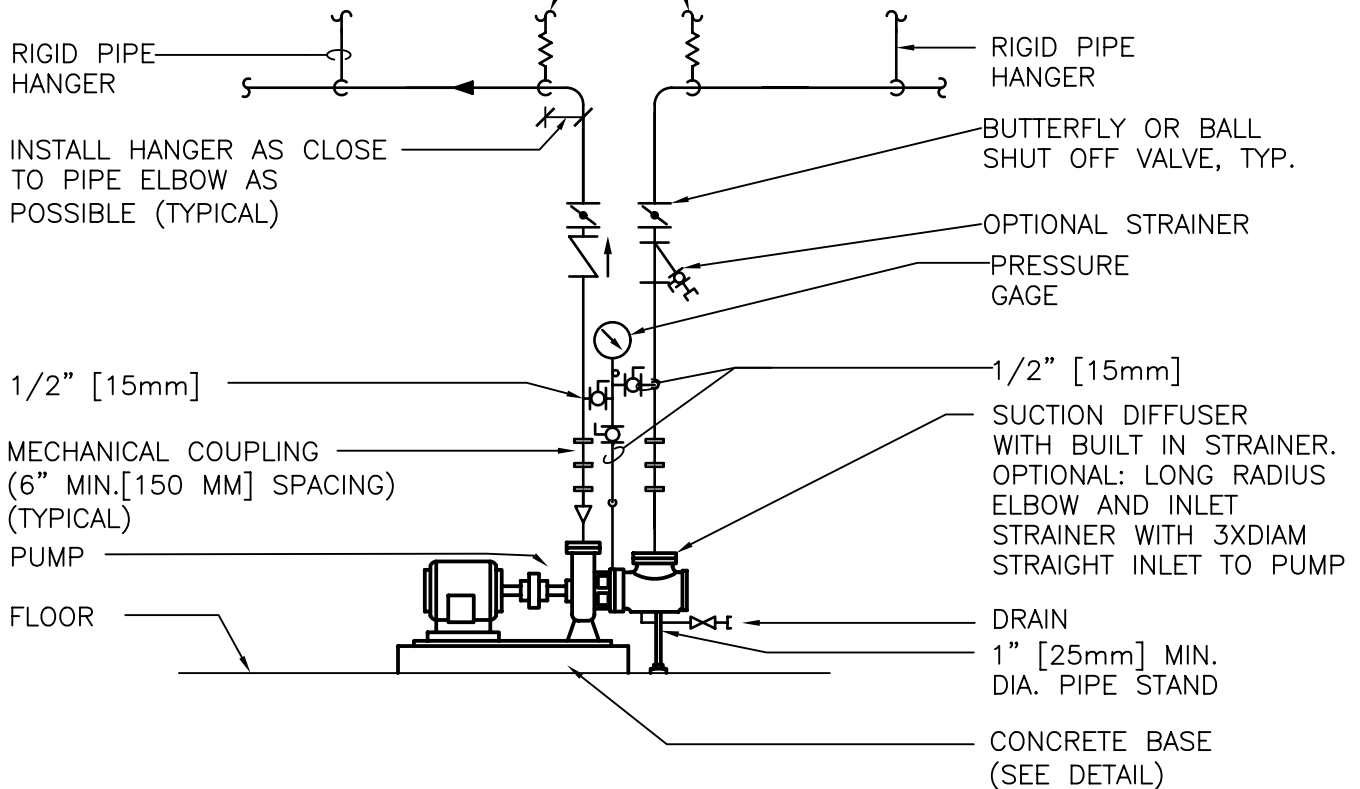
DETAIL TITLE / SINGLE SUCTION FLOOR-MOUNTED PUMPS -
